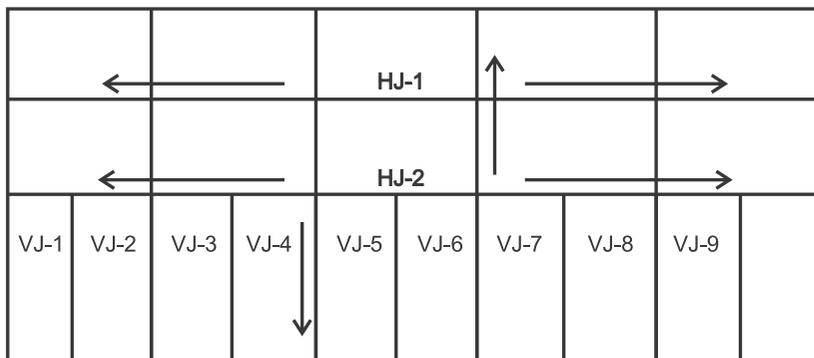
Welding sequence (liner-to-liner welding)
